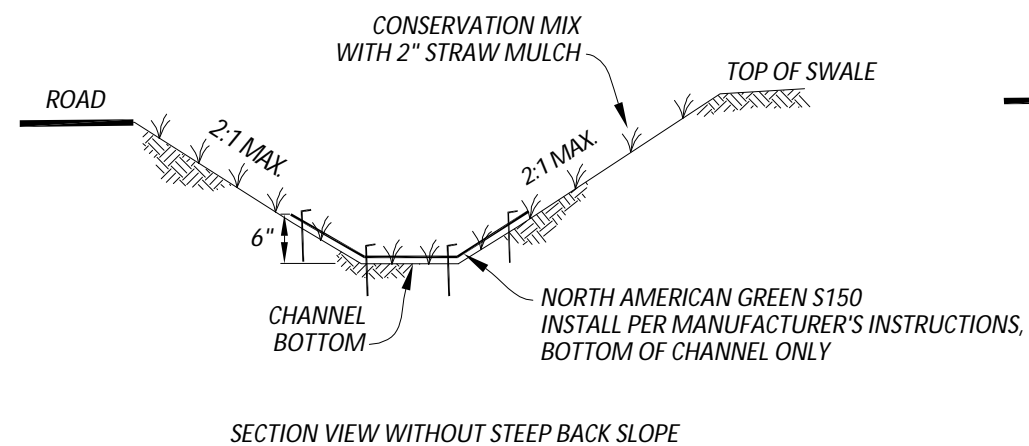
DETAIL A NARROW ROADSIDE SWALE STABILIZATION
